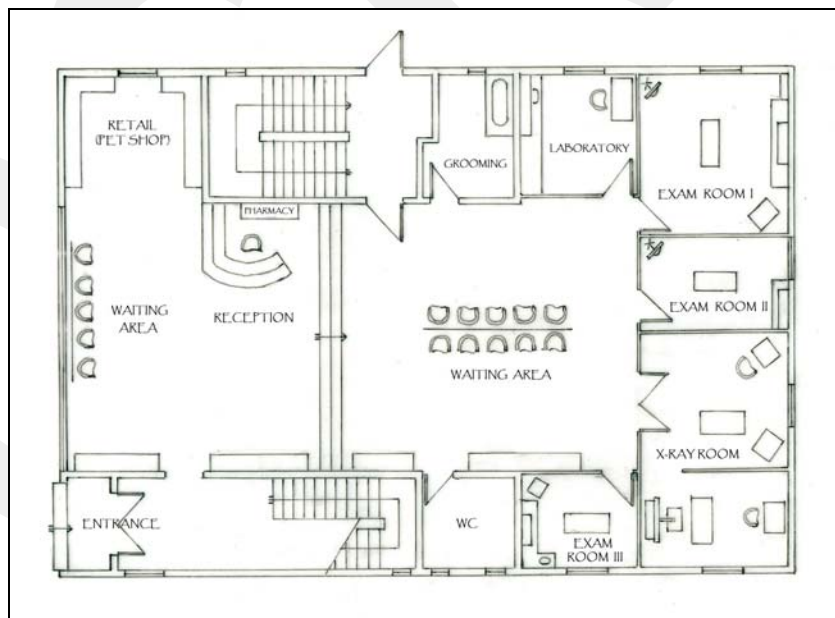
Ground Floor Plan of Ankara Veterinary Medical Center
